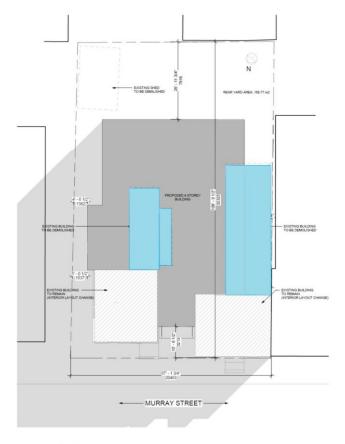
Preliminary site plan of the proposed development. The footprints of the existing buildings have a floor plate of approximately 500sq.ft. (48msq.). Note the relationship of the building at 168 Murray with the adjacent apartment building set behind the two-storey row house.
